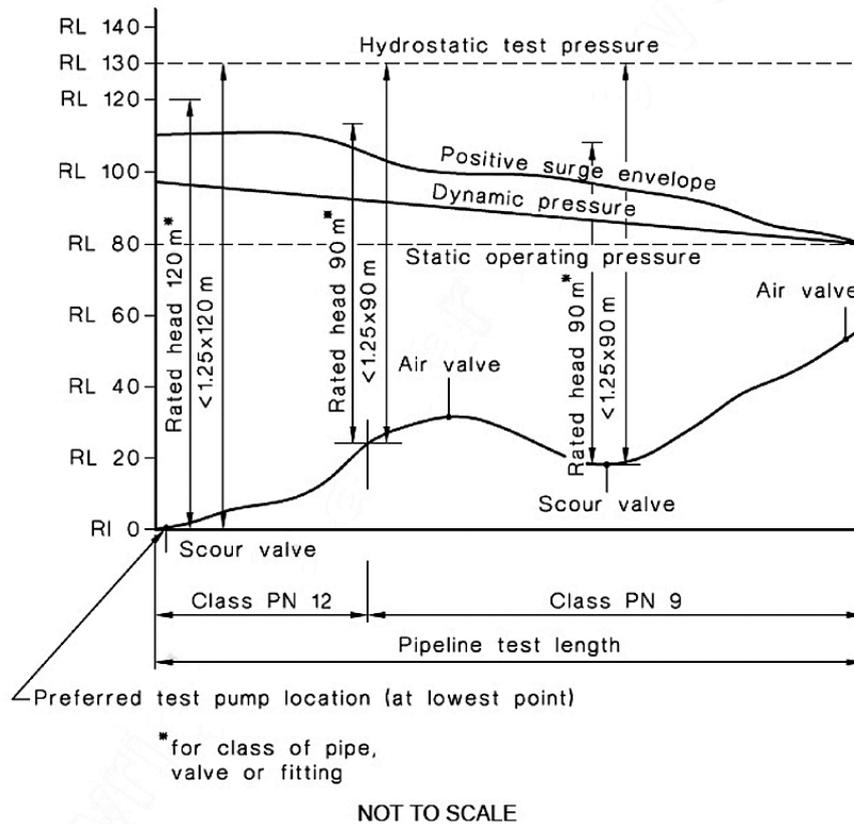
Typical pressure pipeline under field hydrostatic test
